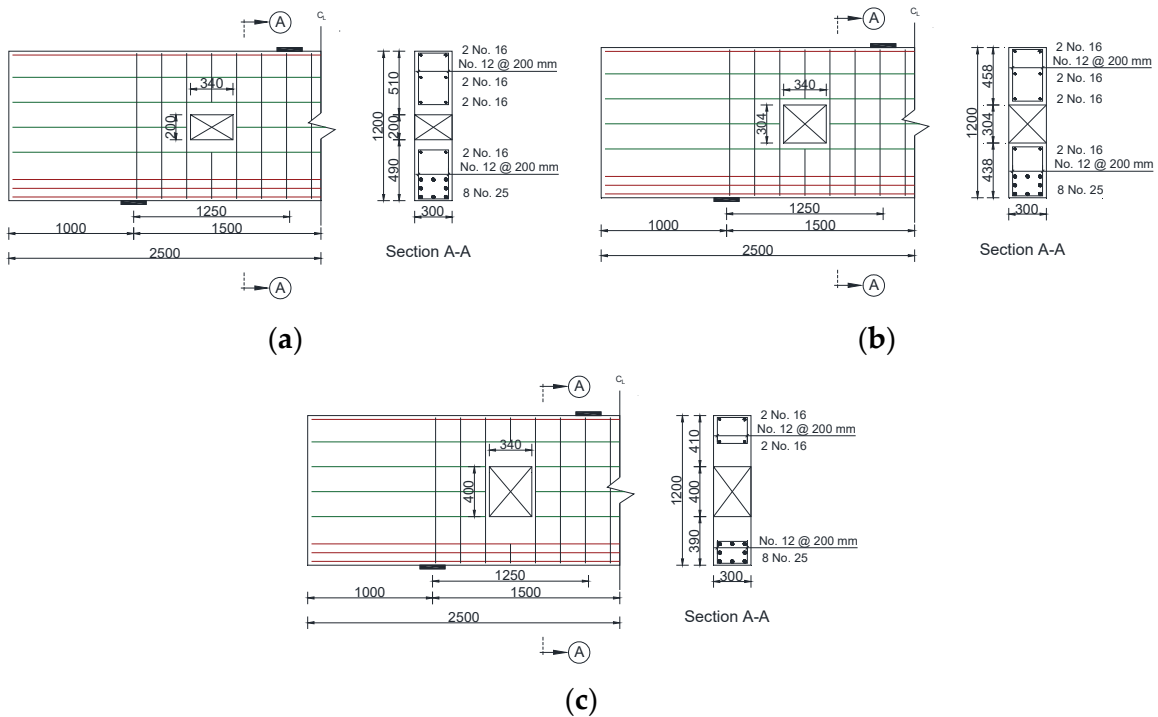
Details of deep beam models with $w_0/a = 0.27$, noting that bars with red, green, and black colors represent the main flexural reinforcement, the horizontal web reinforcement, and the vertical web reinforcement, respectively (dimensions are in mm): (a) $h_0/h = 0.17$; (b) $h_0/h = 0.25$; (c) $h_0/h = 0.33$.
